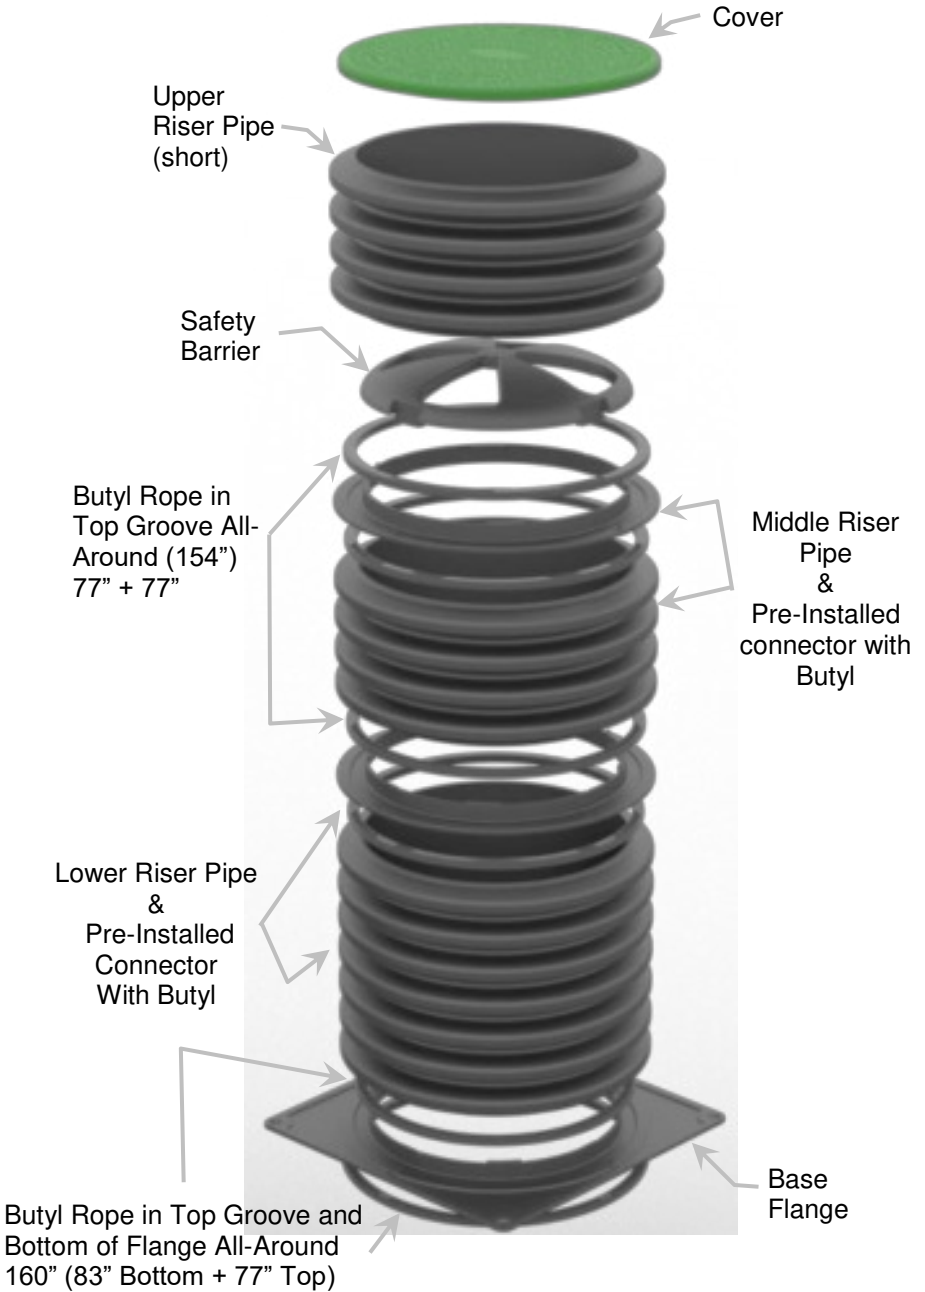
illustrates typical construction of septic tank riser kits 41" – 50" tall.
